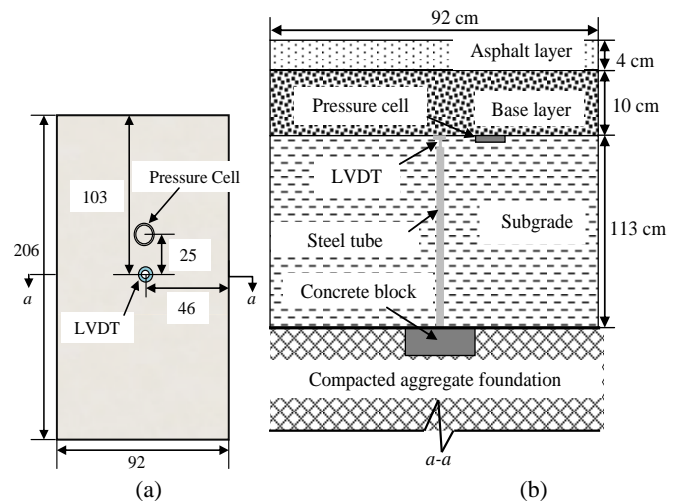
Schematic and Dimensions of a Typical Test Section: (a) Plan View of the Test Section; Cross Section of the Section and Position of the LVDT.
